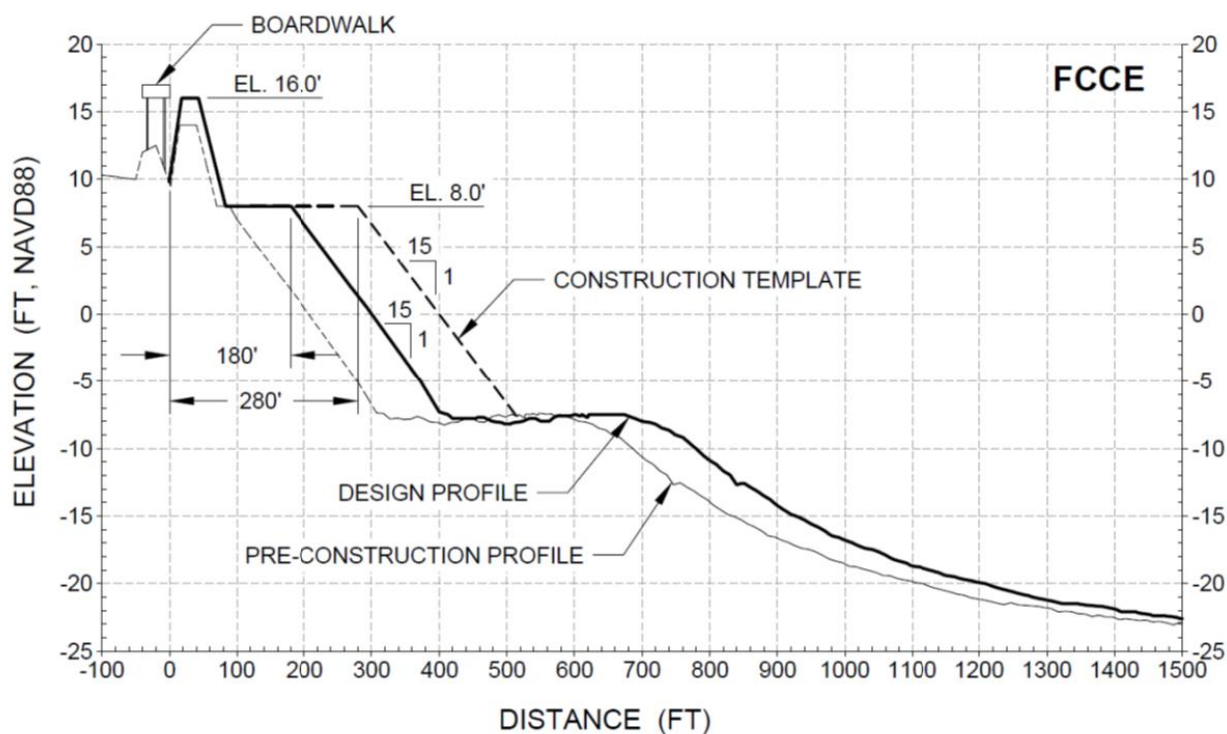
WRDA 1974 Construction Template and Design Profile (Reach 4)
